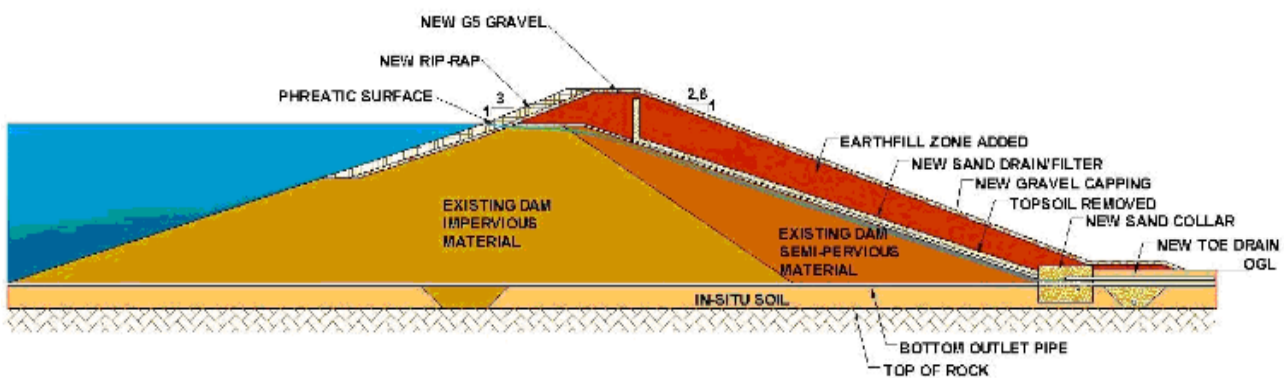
FIG. EXAMPLE OF RAISING OF EMBANKMENT :CROSS SECTION AT BOTTOM OUTLET
